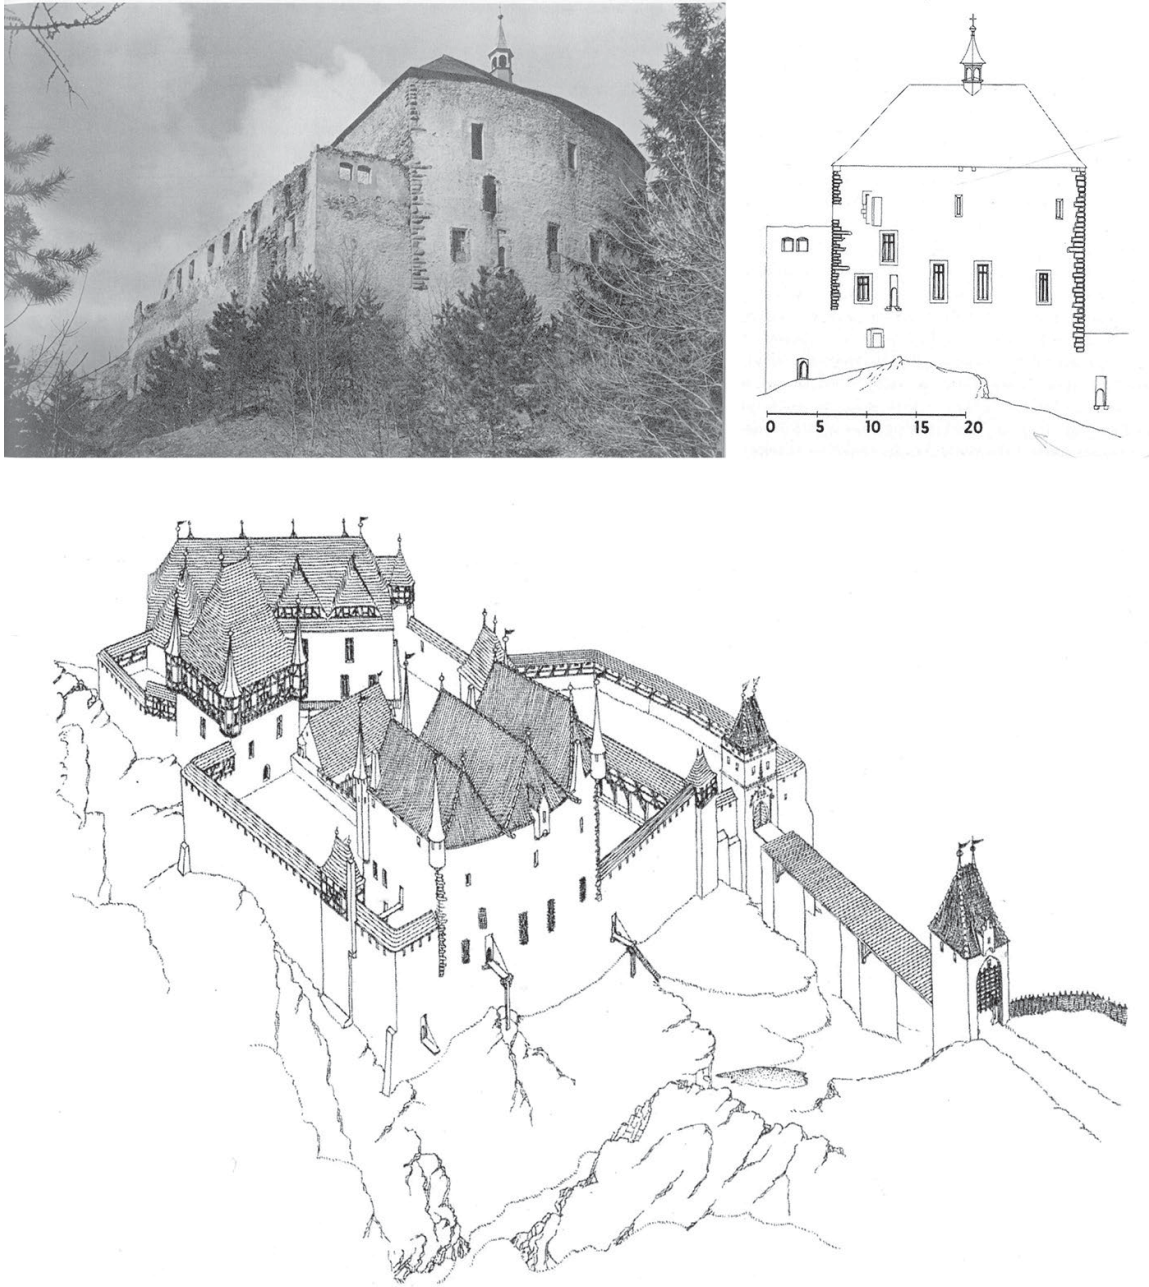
Ruin of the royal Točník (Totschnik) castle, ca 1400; photo of the fundamental building structure, building survey and reconstruction from the bird's eye perspective (1972).
